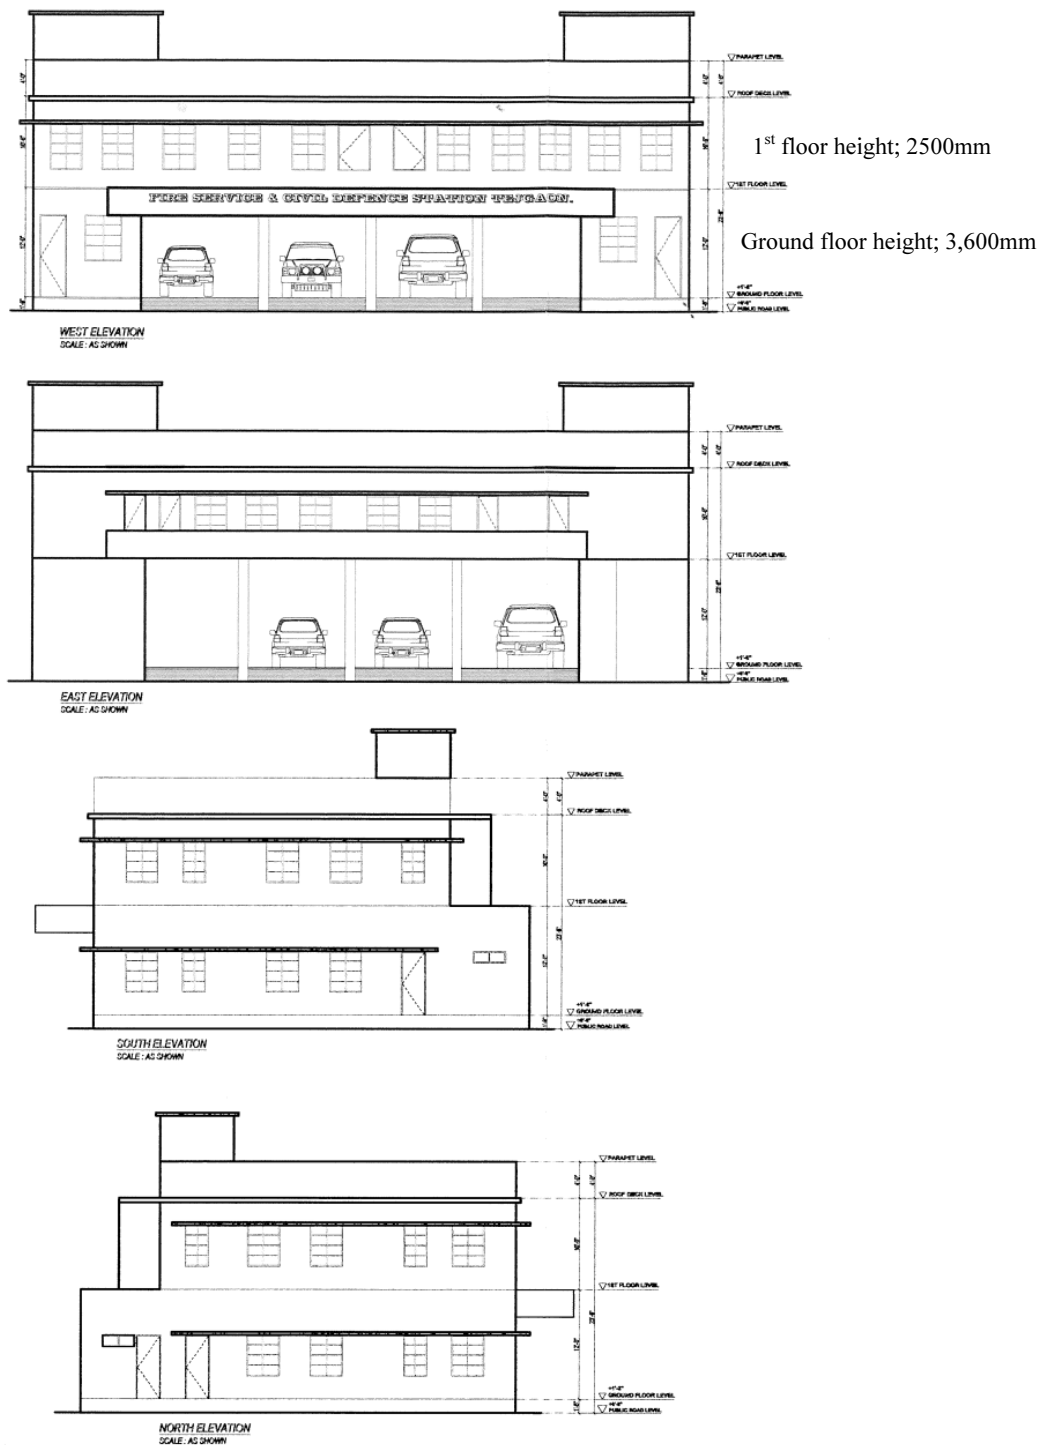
Elevation drawing (storey height 3,600mm, 2,600mm at 1st storey)
